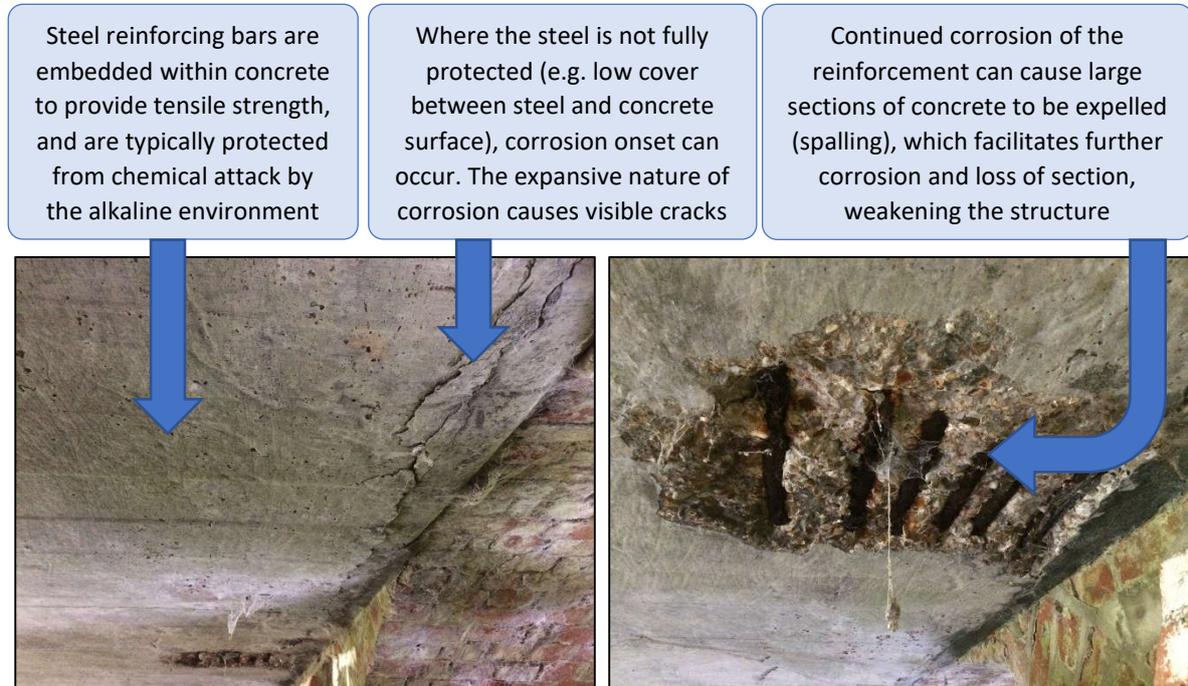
Reinforcement corrosion-induced cracking and concrete spalling in a normally-reinforced concrete deck slab
